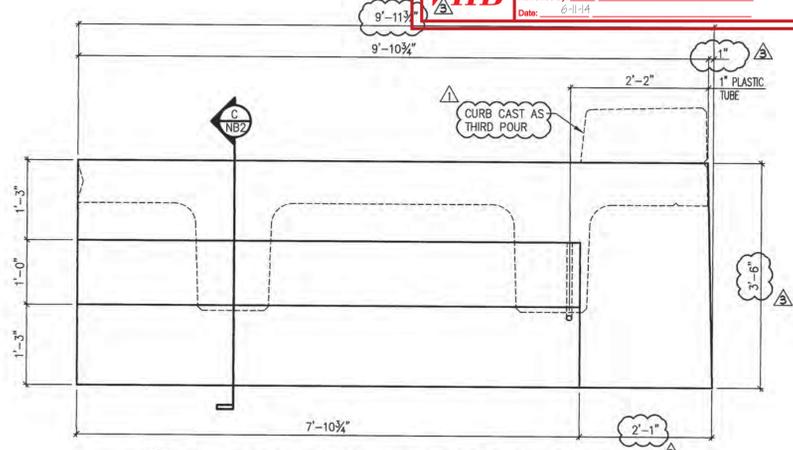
DETAIL "A" - END OF NEXT BEAM (TYP.) (PRIOR TO CASTING CURTAIN WALL) 3/4\"/>
